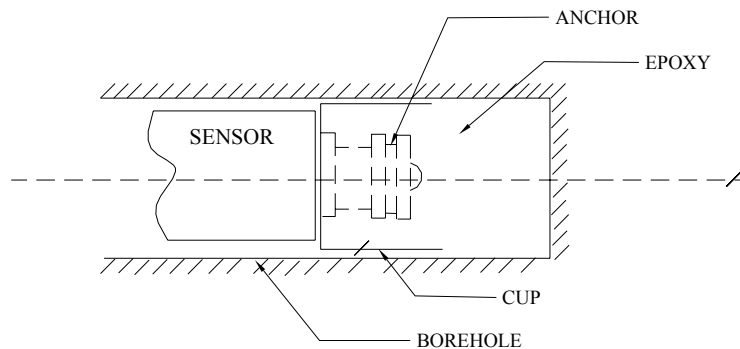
Schematic illustration of a retrievable sensor installed at the borehole bottom.
